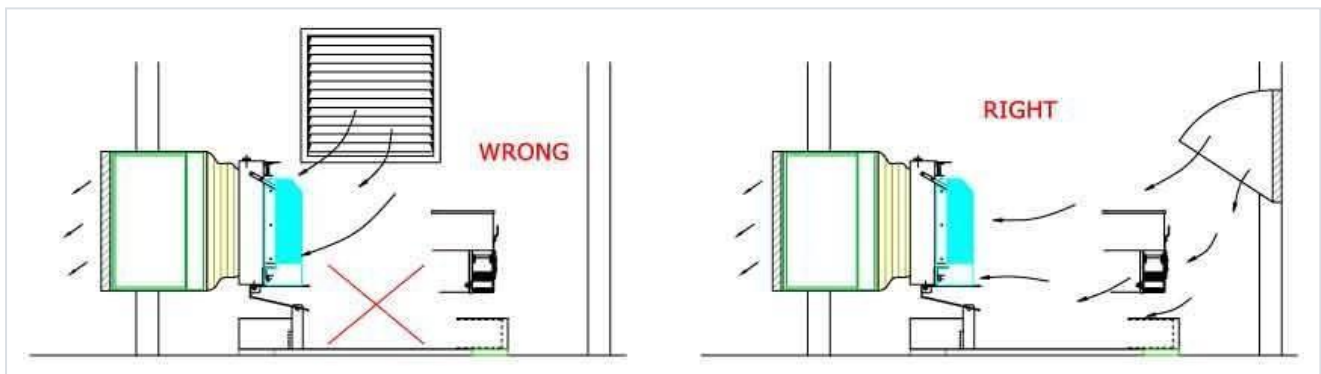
(wrong) and FIG. 7 (right) — air inlet arrangements.
